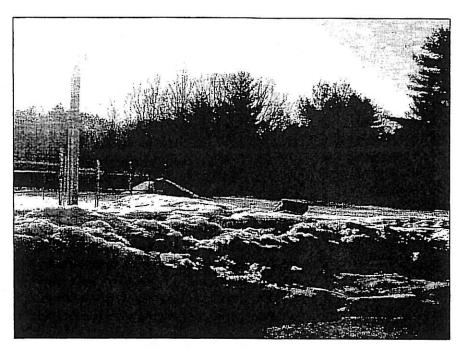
View of existing Laconia Meter Station fencing (left) and proposed additional temporary workspace from Broken Bridge Road, view facing southeast.
